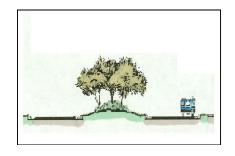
X - Cul-de-sac Section - May Incorporate Plantings
